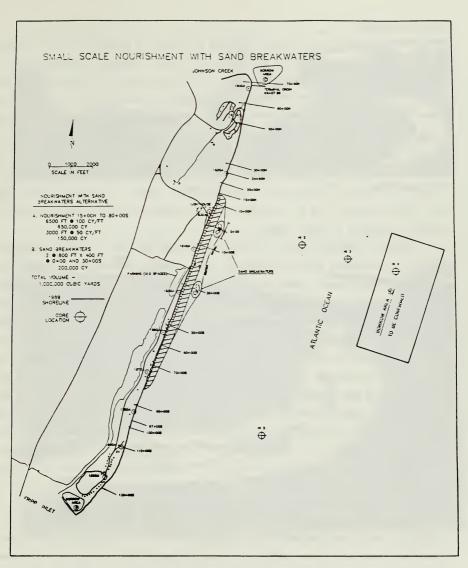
Small-scale nourishment alternative with sand breakwaters positioned at the primary beach accesses near stations 0+00 and 30+00S.
